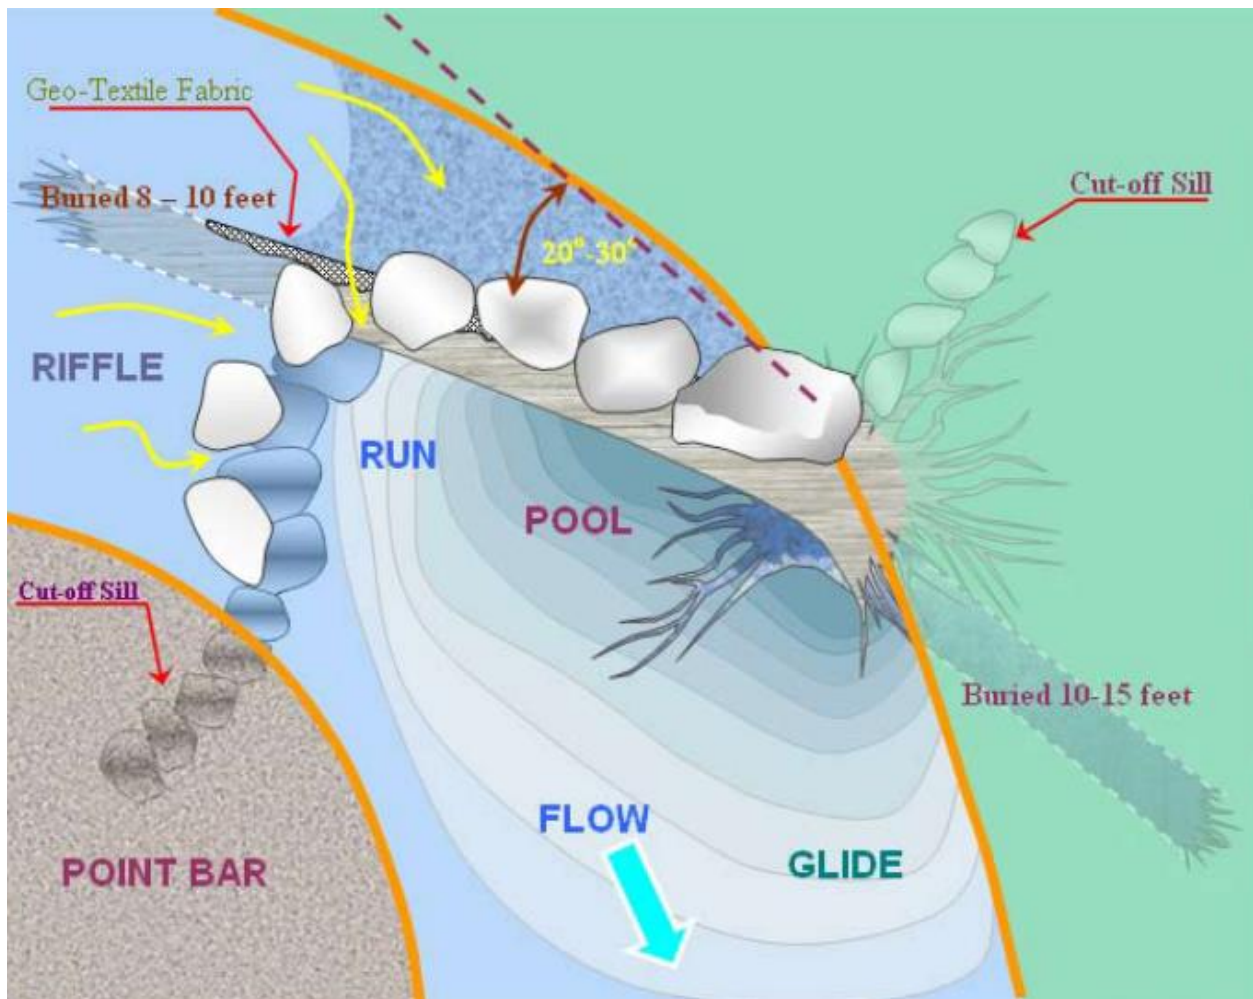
Plan view of a j-hook vane incorporating woody material (NRCS, 2007a).
